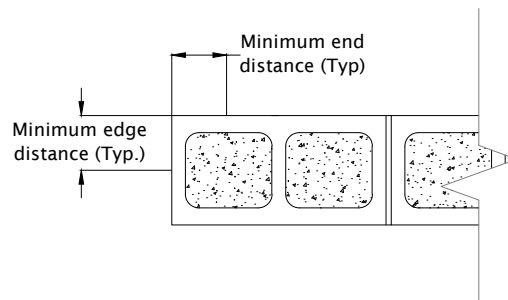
TAP UNIVERSAL SCREW ANCHORS INSTALLED INTO GROUT-FILLED CONCRETE MASONRY
